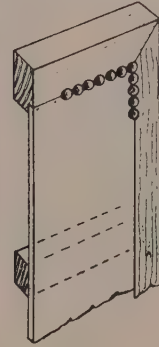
DOOR WITH SINGLE PLYWOOD PANEL.
